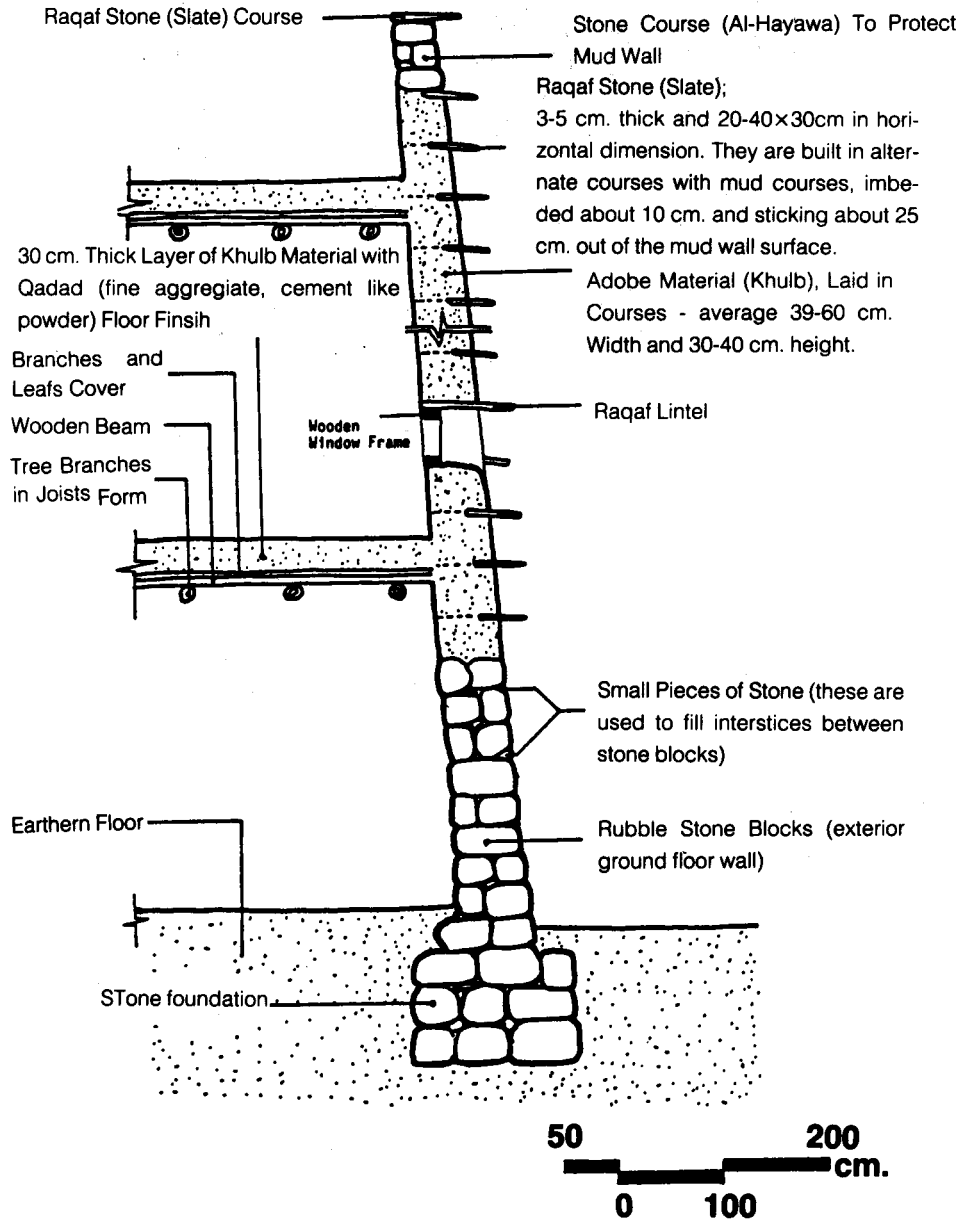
Cross section showing materials and the construction system of the exterior wall, floors and roof of a typical multi-story residential building.
